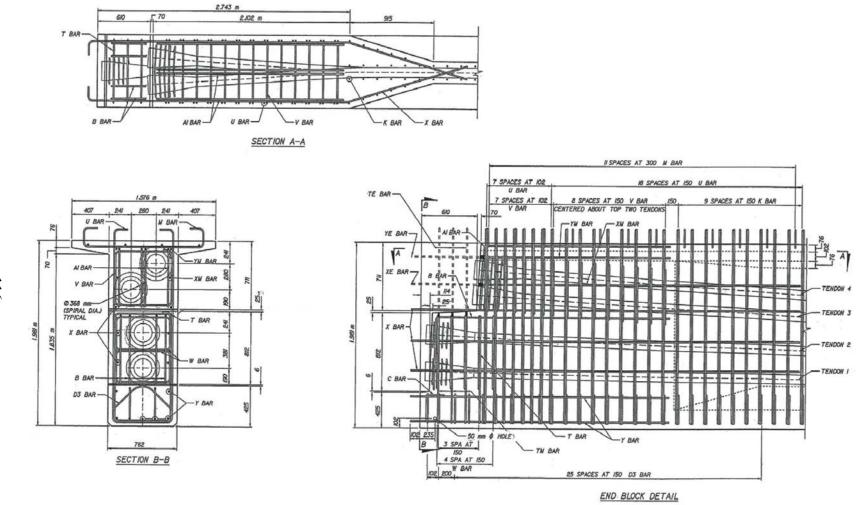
Illustration. Modified Florida bulb-T78 beam end block detail.
